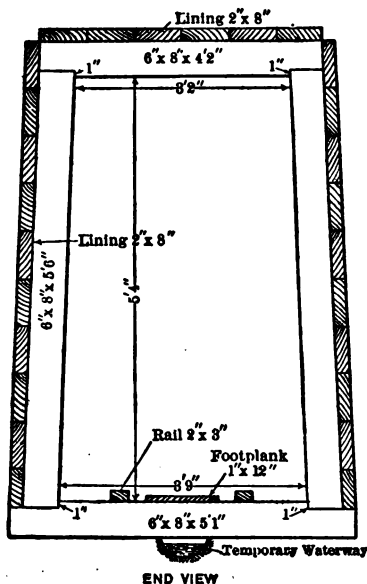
Timbering Details, Portland Drainage Tunnels.
